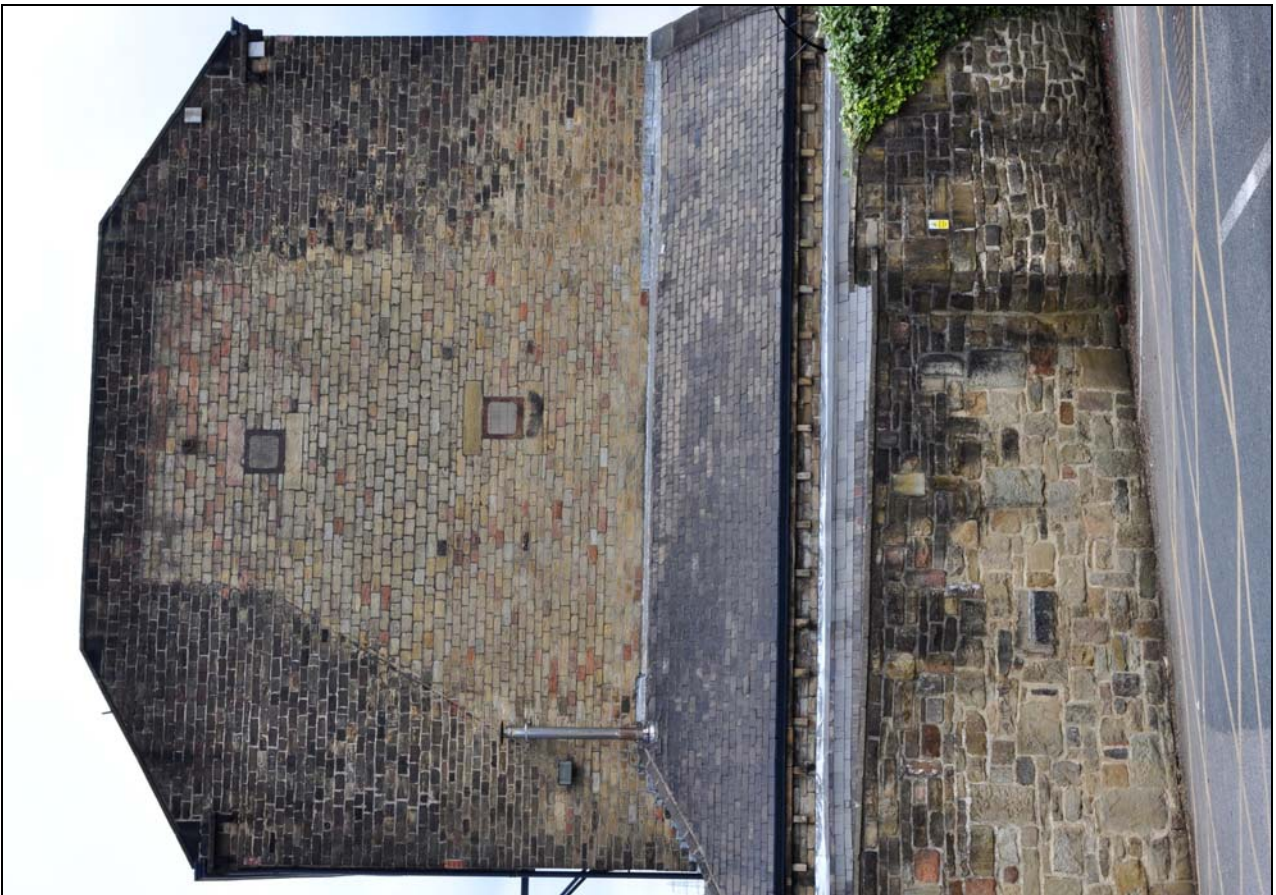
Engine house with end wall of mill behind, with outline of former rope race, from the south-west
